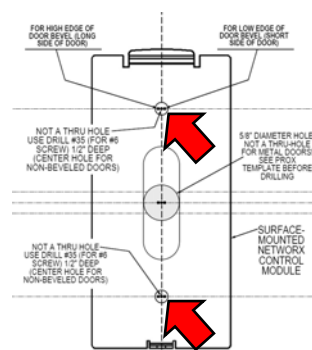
B: 7/64" PILOT HOLE ON INSIDE DOOR SURFACE FOR CONTROL UNIT PLATE
